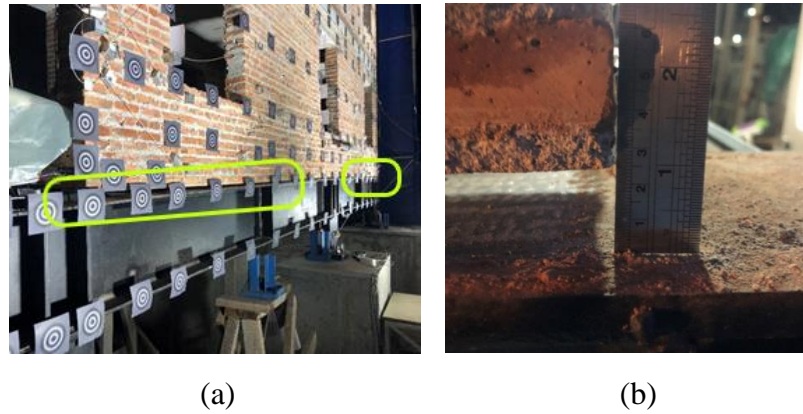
Gapping occurred between reference building's front wall and steel beam: (a) general view, (b) close-up view.
